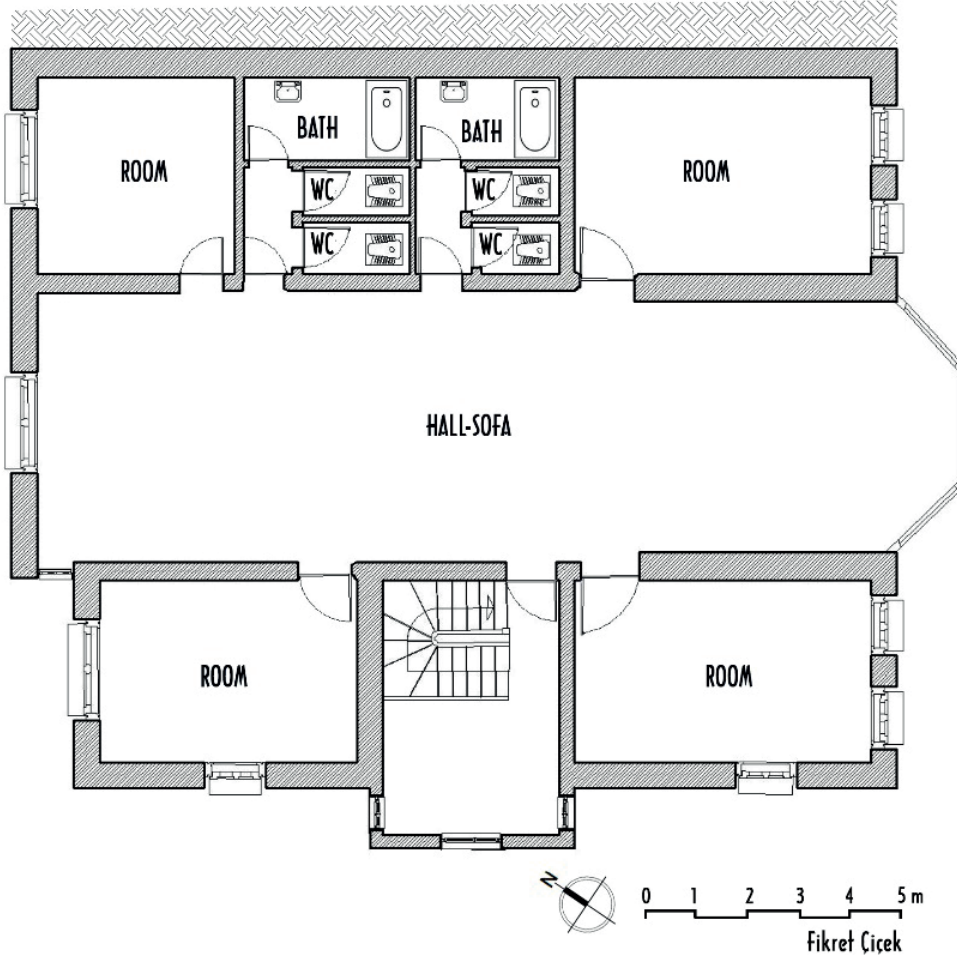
First Floor Plan of Arapoğlu Kosti House (Fikret Çiçek Archive)
